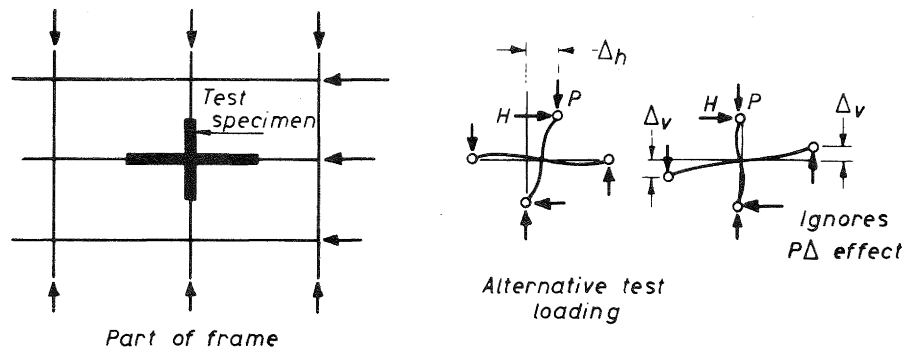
BEAM-COLUMN JOINT TEST UNITS AND LOAD APPLICATION
